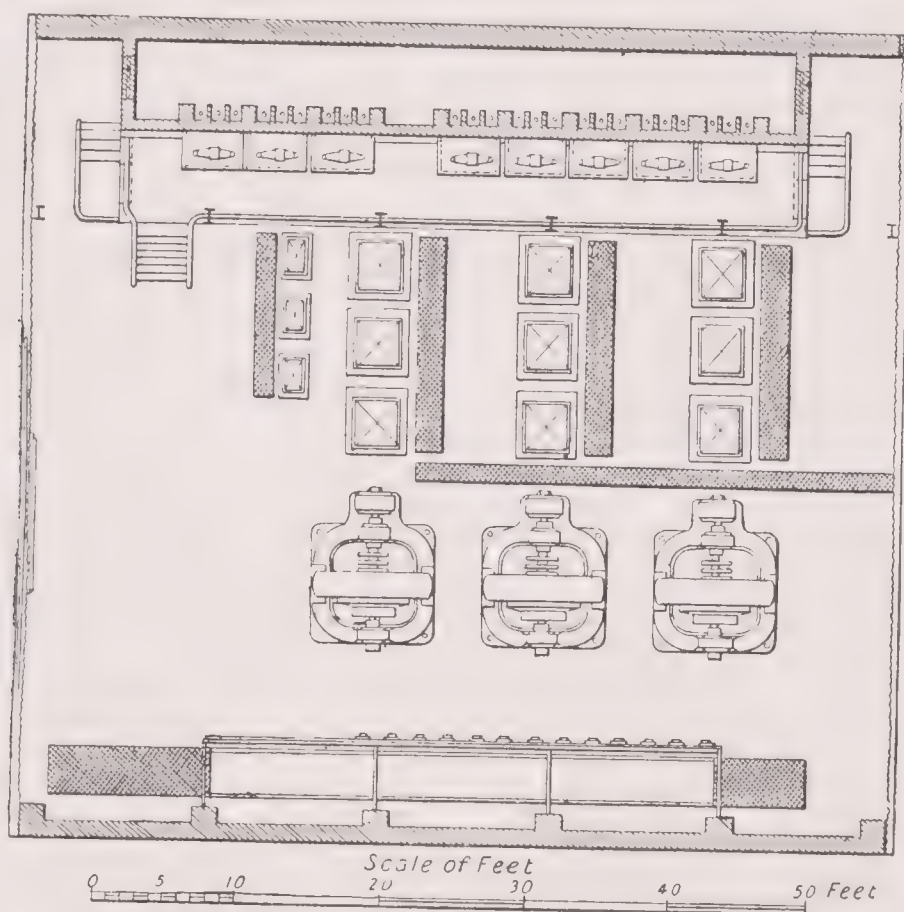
NORTH-EASTERN RAILWAY: GROUND PLAN OF TYPICAL SUB-STATION.
